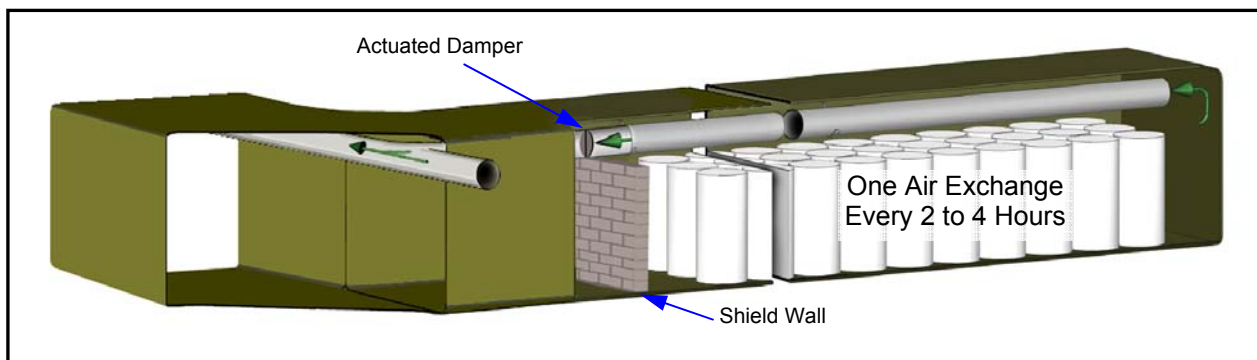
Filled Emplacement Room – Typical ILW and Heavy LLW
